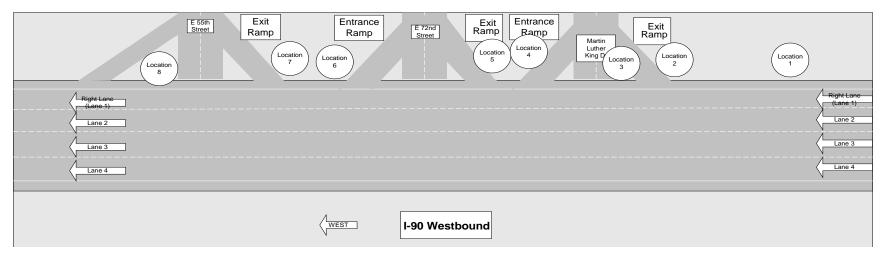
Drawing of Trailer Locations on I-90 Westbound after Construction
